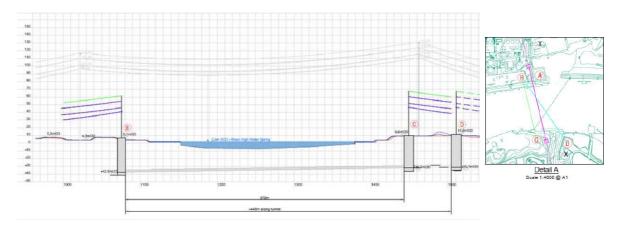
Indicative tunnel crossing and potential tunnel shaft locations
